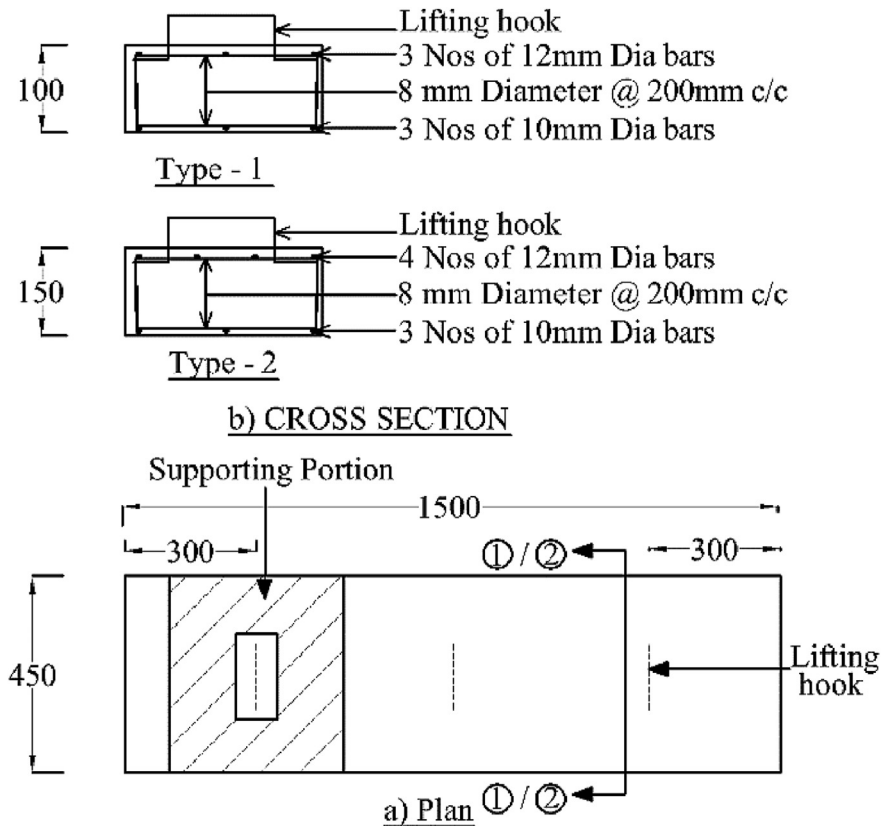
Schematic sketch of reinforced concrete slab is shown in a) Plan view and b) Cross section details.
